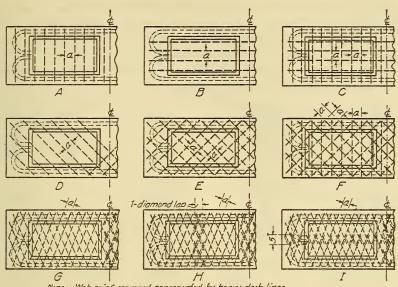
Cross sections of test beams between pilasters showing horizontal reinforcement
